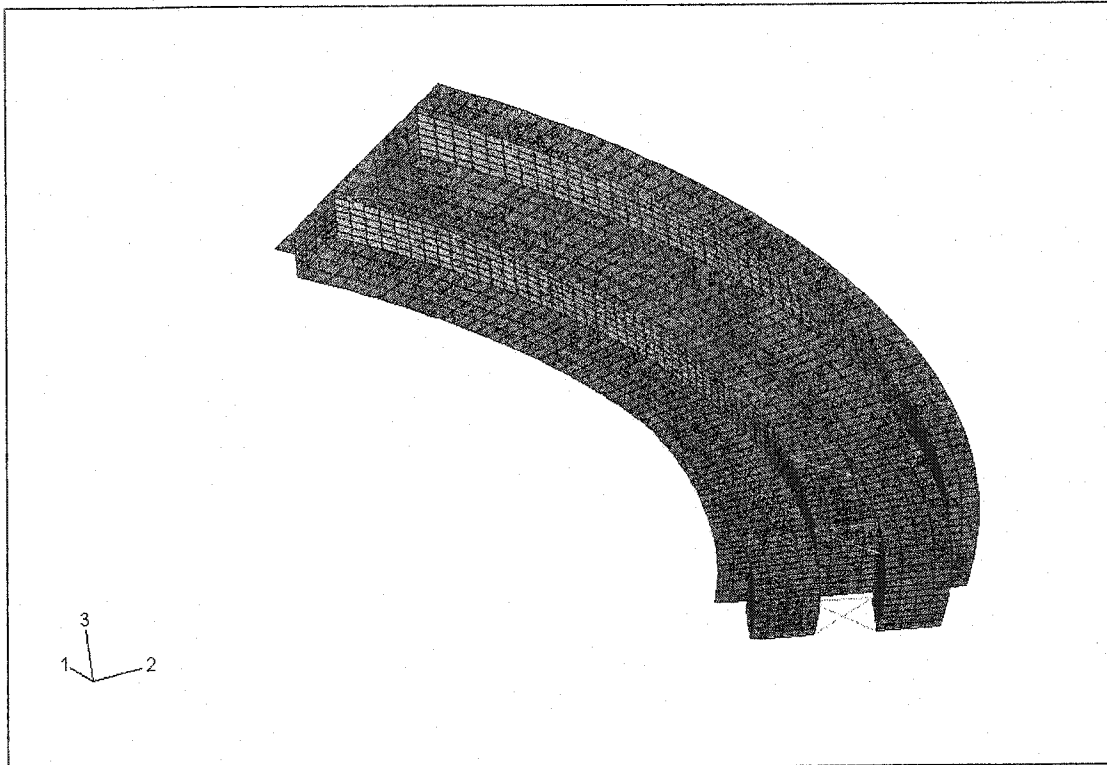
ABAQUS model view of bridge model M1 with concrete deck
